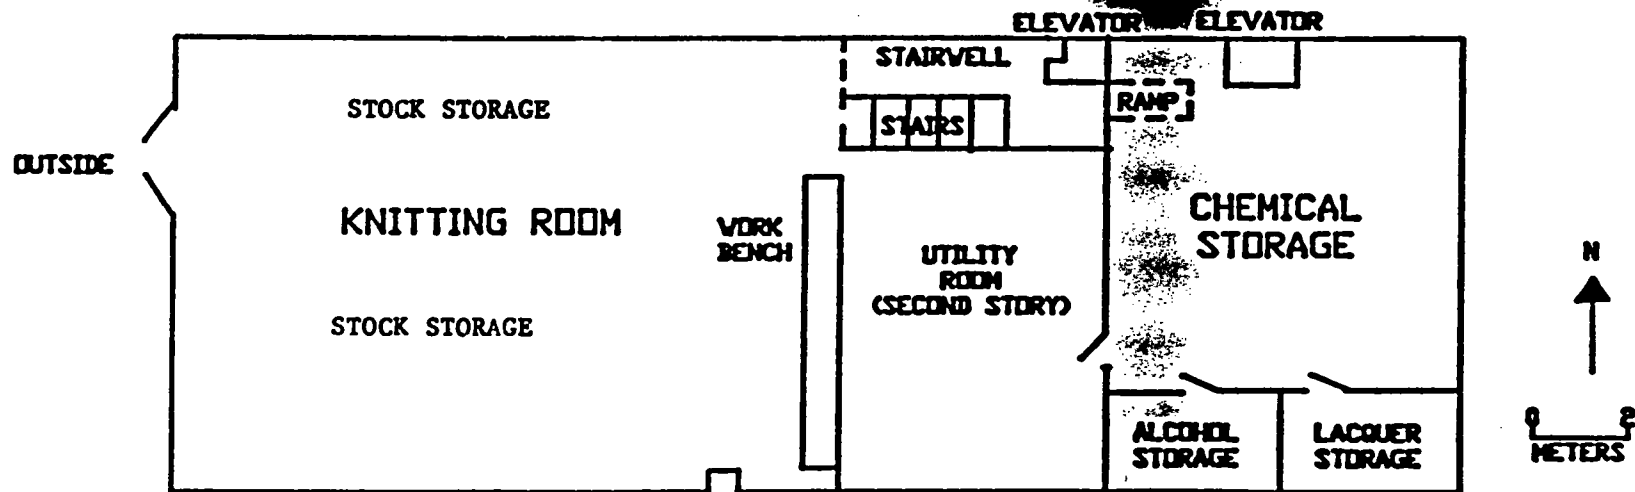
Floor Plan of the Sunflame Appliances Facility Basement.
